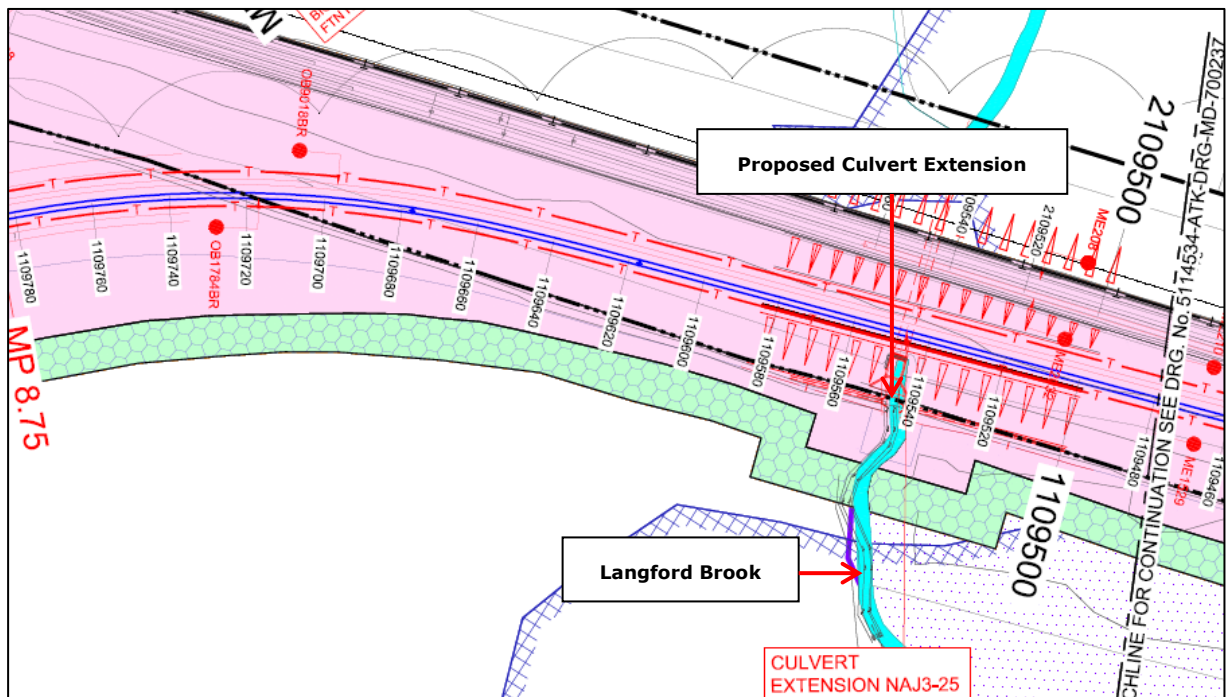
Proposed Culvert Extension. (Atkins 2012. Coordination Drawings)
